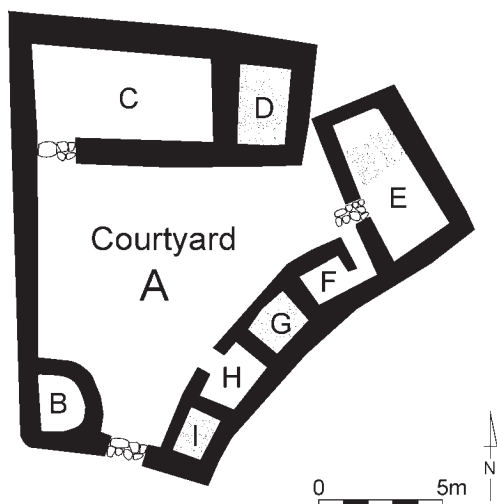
Sha’ar Hagolan: Schematic Plan of Building Complex I in Area E.
